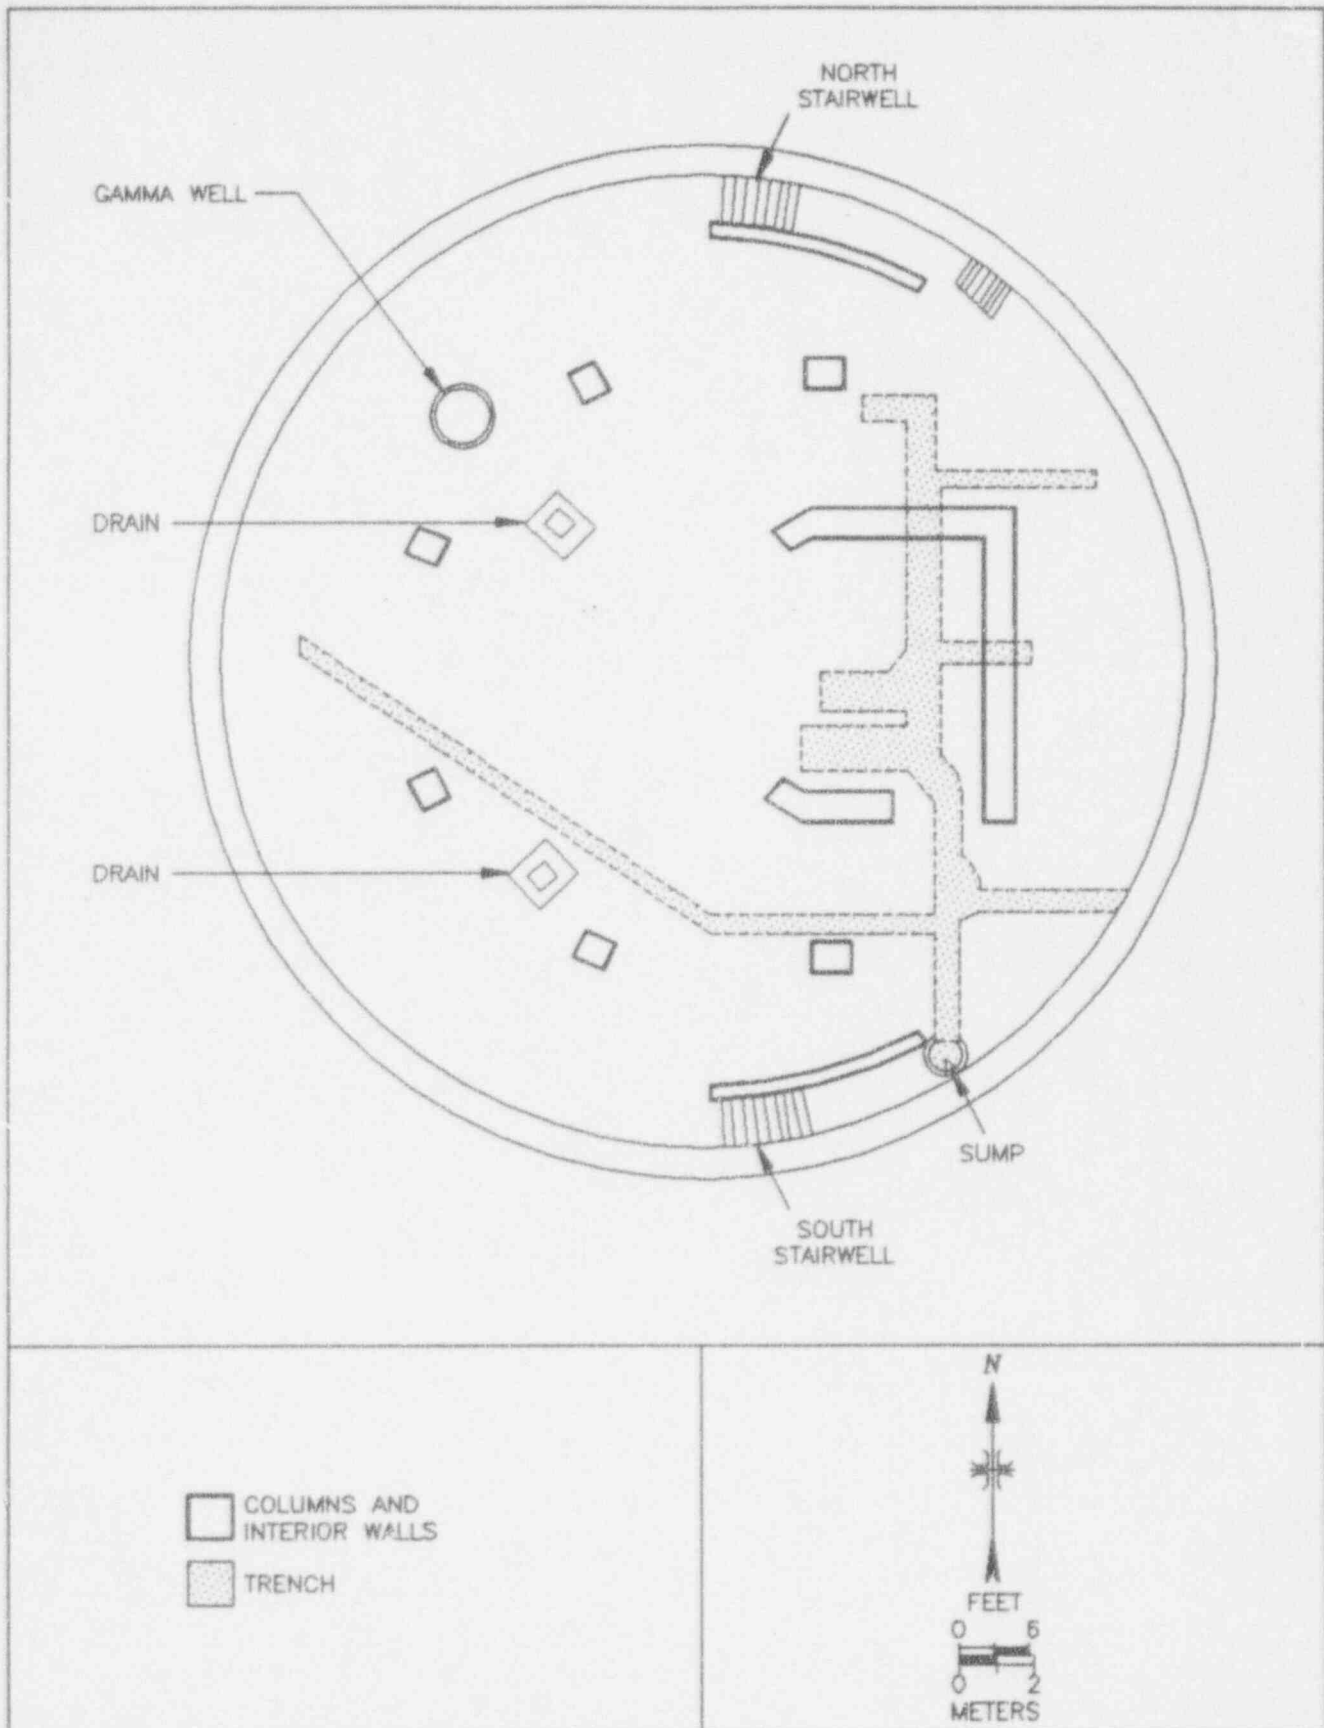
Plot Plan of Building 100, Basement Level Floor
